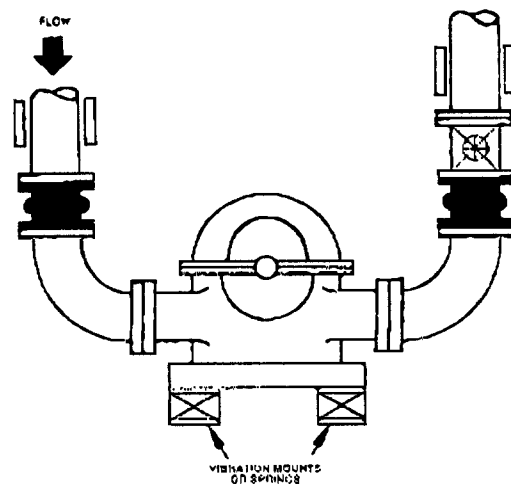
D: Typical Pump Installation With Expansion Joints Utilizing Vibration Mounts
